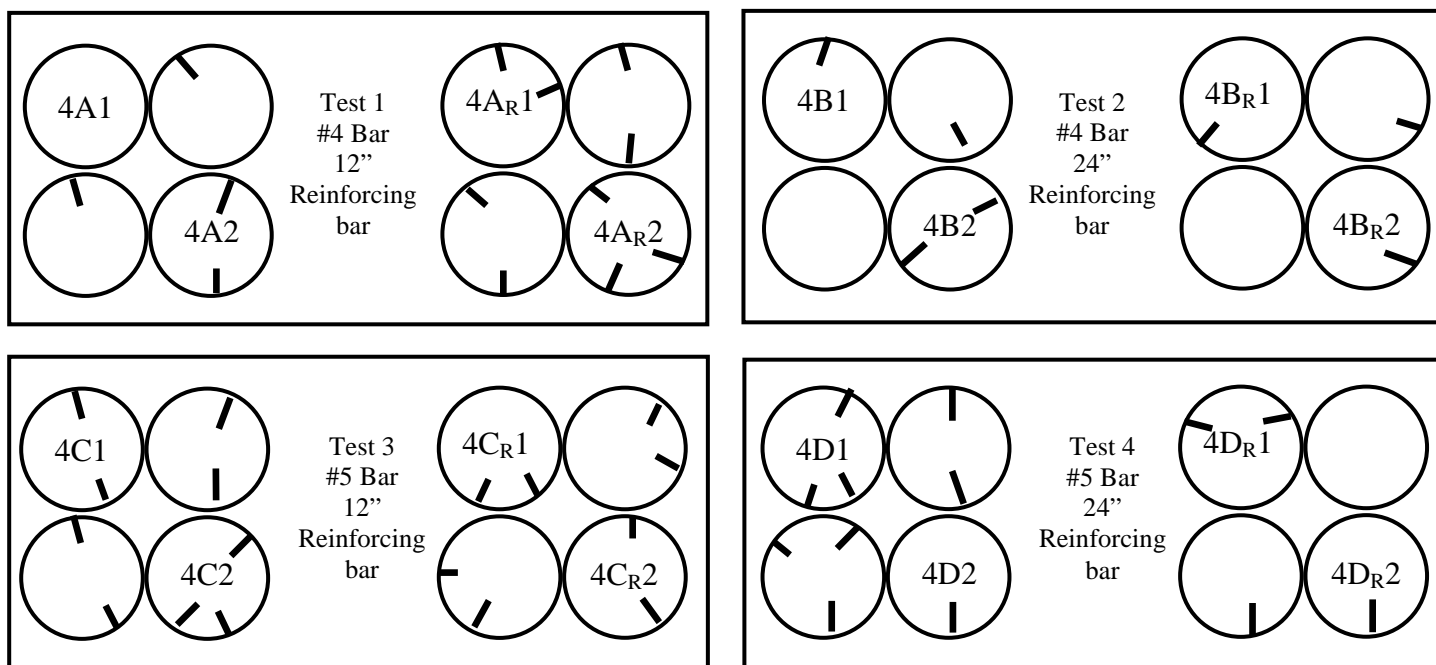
Four culm specimen instrumented culm designations and location of dominate splitting cracks.
